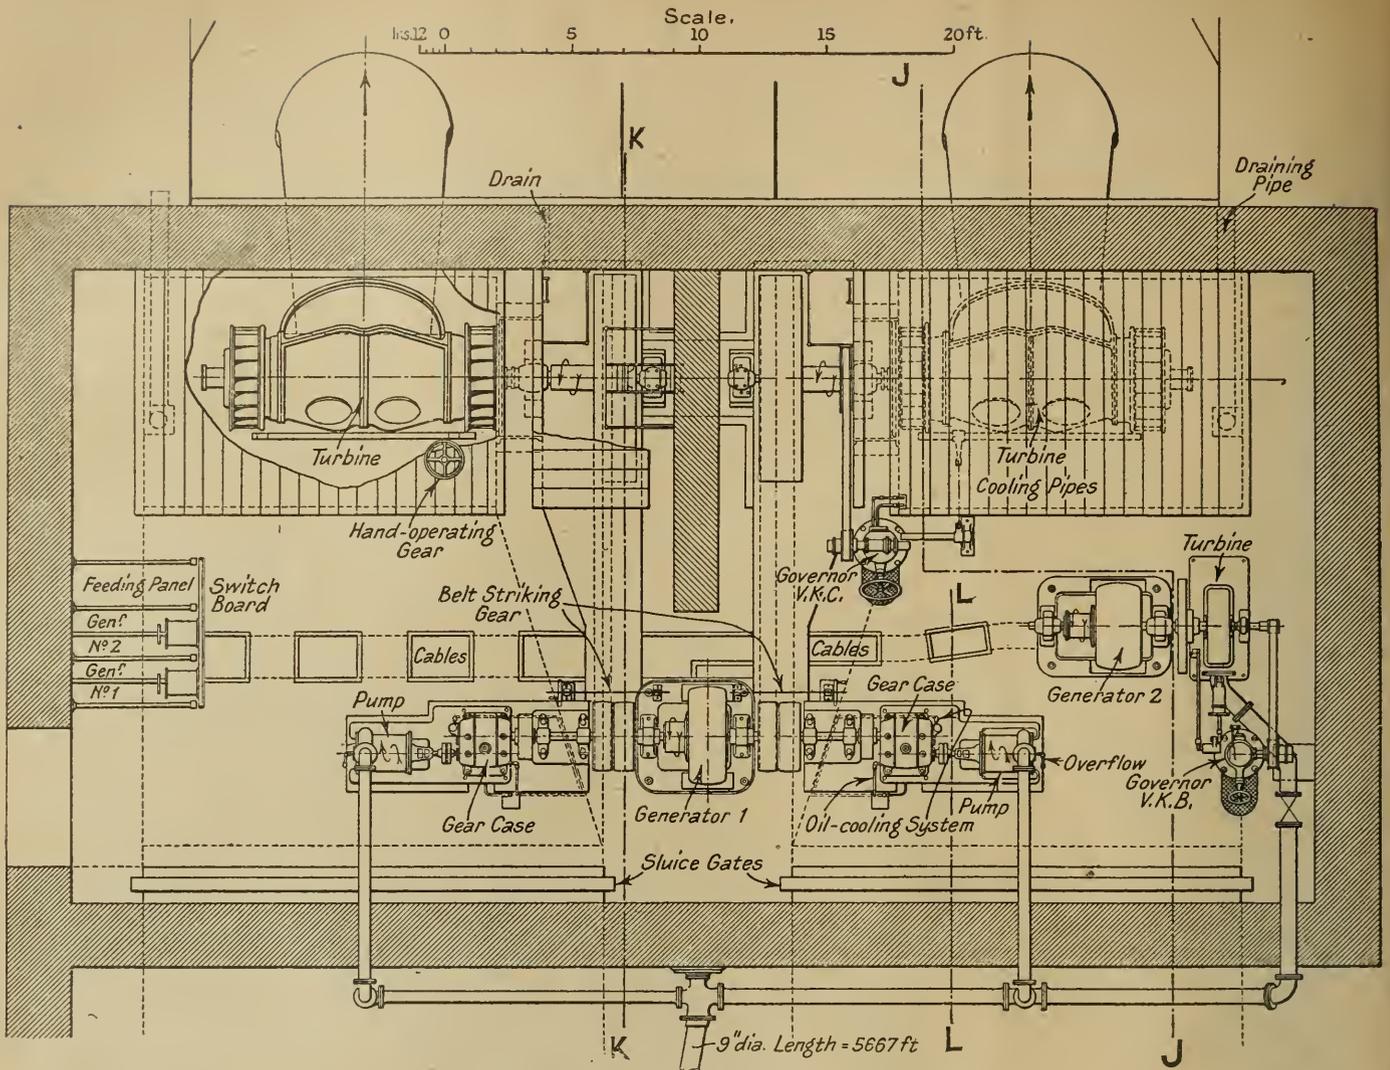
PLAN SHOWING GENERAL ARRANGEMENT OF PLANT.
